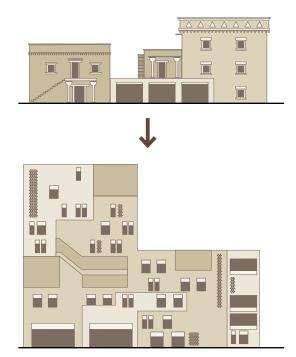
Adaptation of traditional architectural elements to a contemporary building
